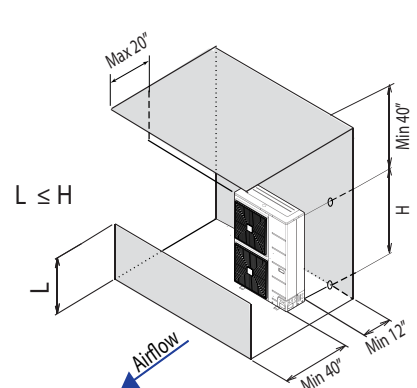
Single Unit—high rear wall and low front wall with building overhang and no side walls
